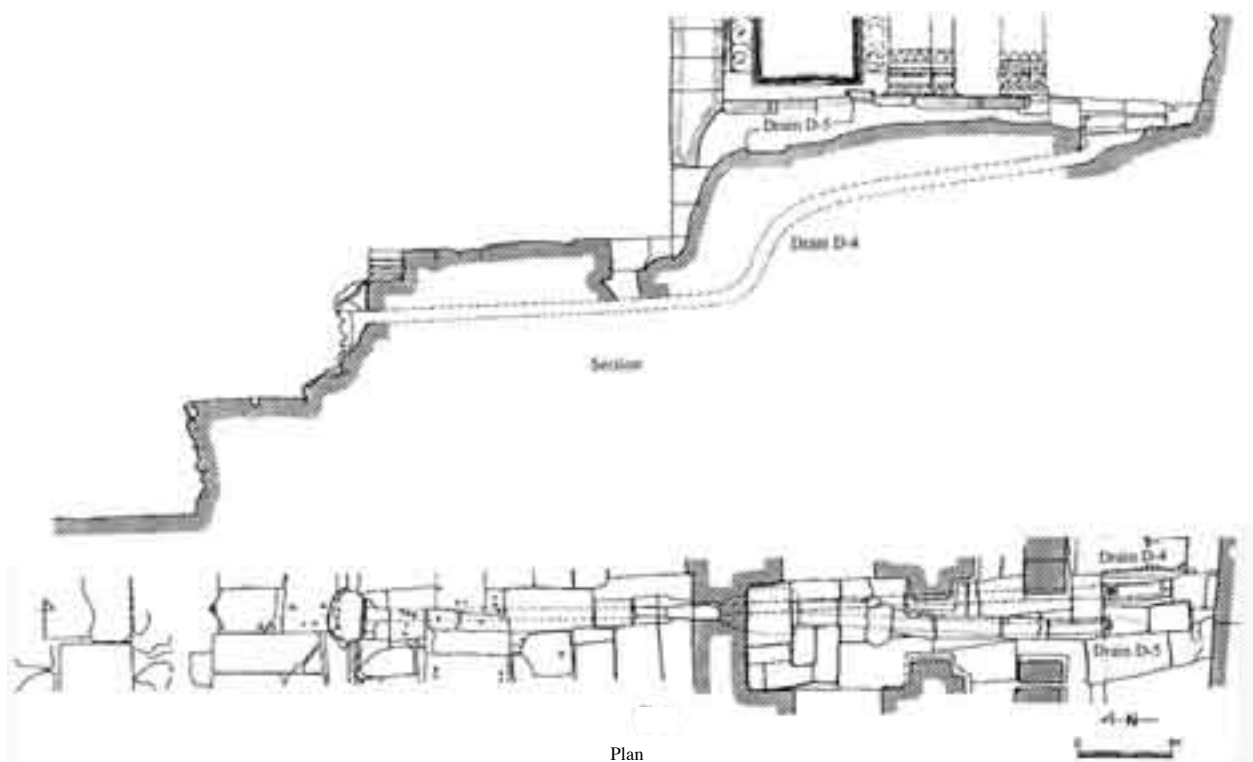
The plan and section of Drains D-4 and D-5.
